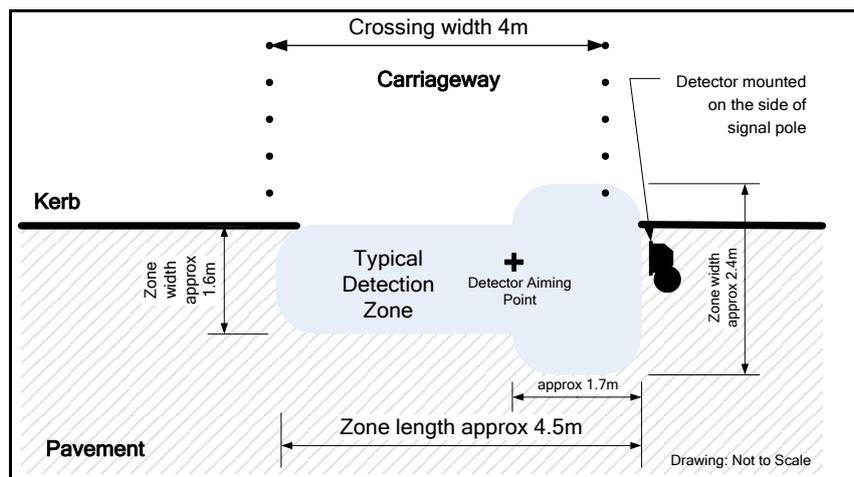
Pedestrian Kerbside Detector Installation – Plan View
